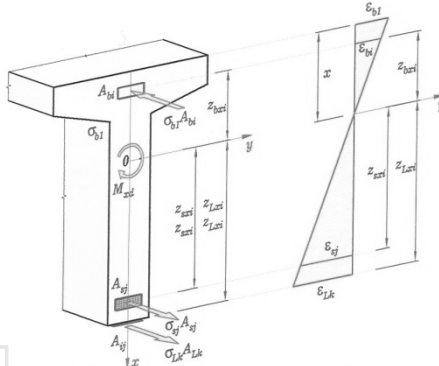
The calculation scheme of the normal section of reinforced concrete bending element reinforced with glued strips
